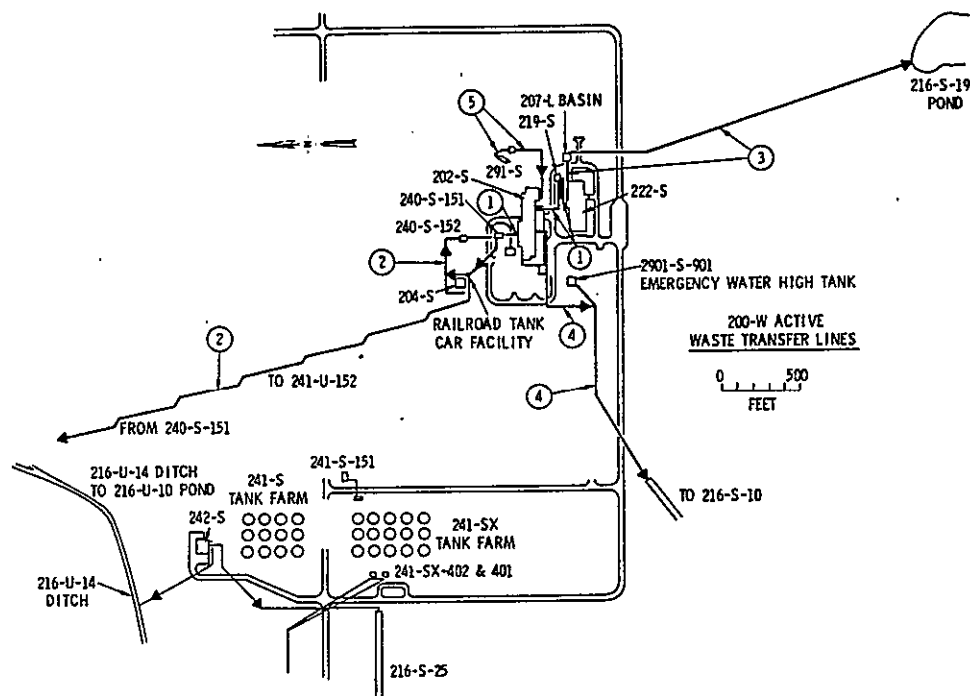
C-28 REDOX PLANT AND 222-S LABORATORY ACTIVE WASTE TRANSFER LINES
